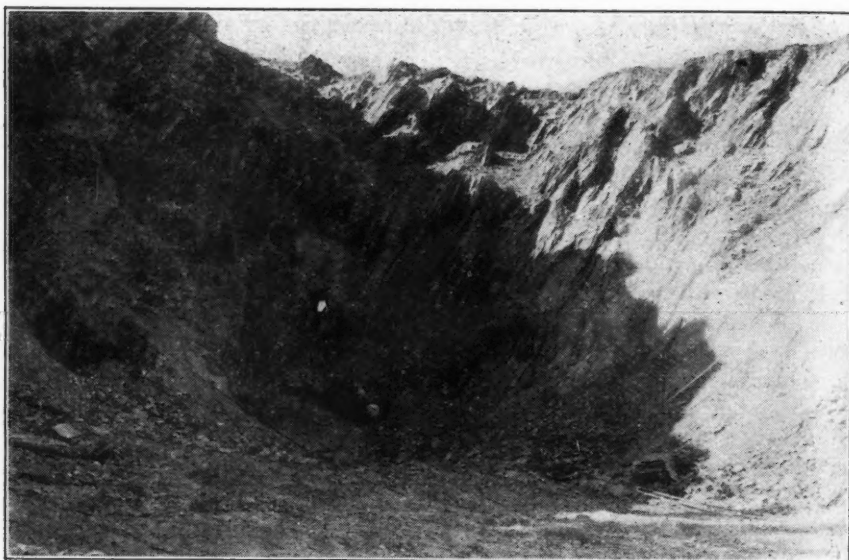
FACE OF HIGHWAY CUT EXCAVATION OVER TUNNEL
